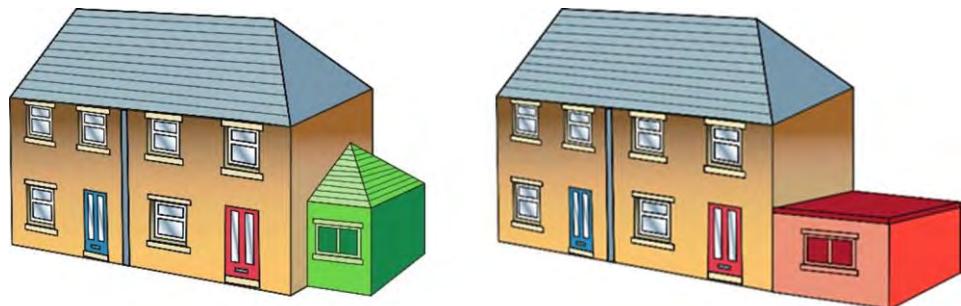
The left image shows a single storey extension proportionate and set back from the existing building line with an appropriate roofing design to match the existing house. The right image shows a poorly designed single storey side extension which is not set back from the building line and with a flat roof which does not match the existing house.
